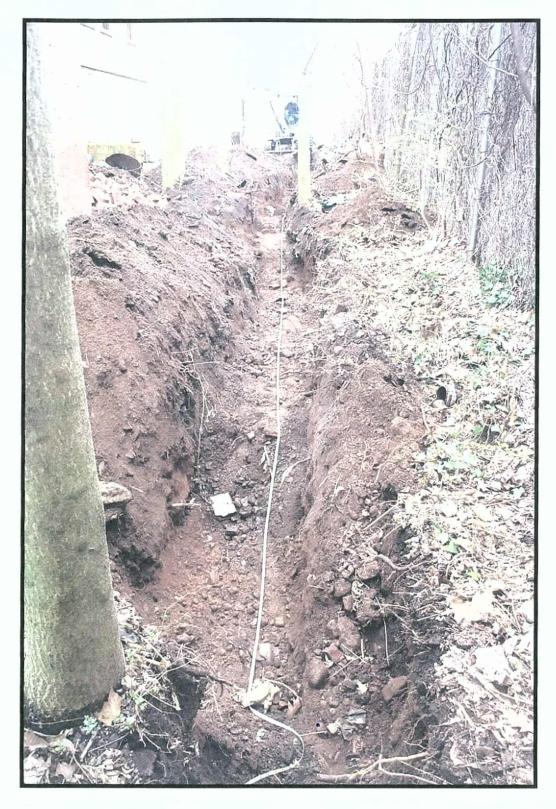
Backhoe Trench 5a - View North From Southern End of Trench
